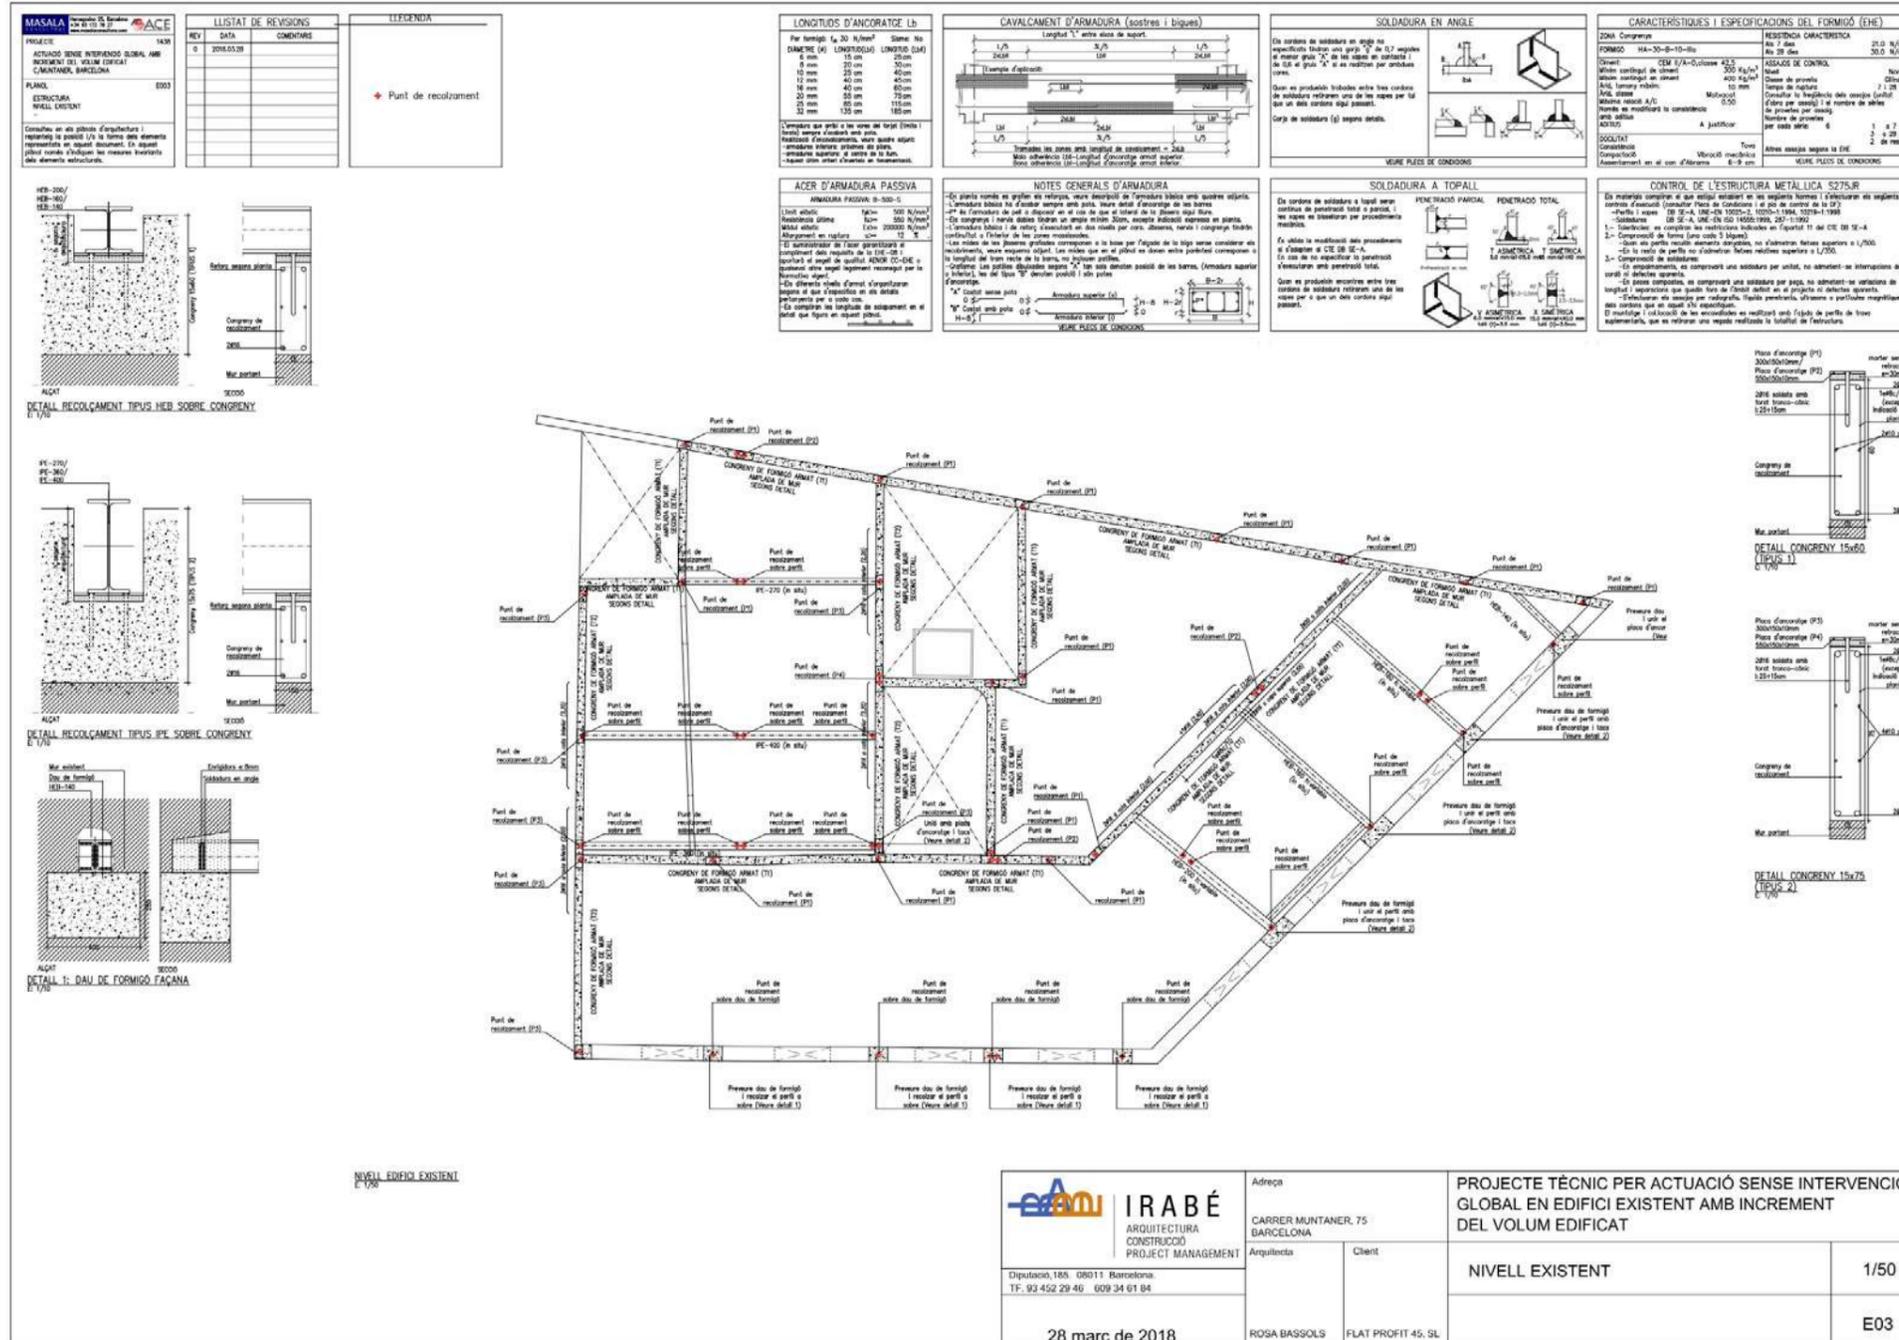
Structure plan of the existing roof level before the addition of the modules.
